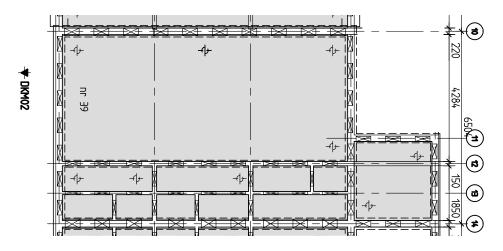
Plan floor slab piling (TM, 2011).
